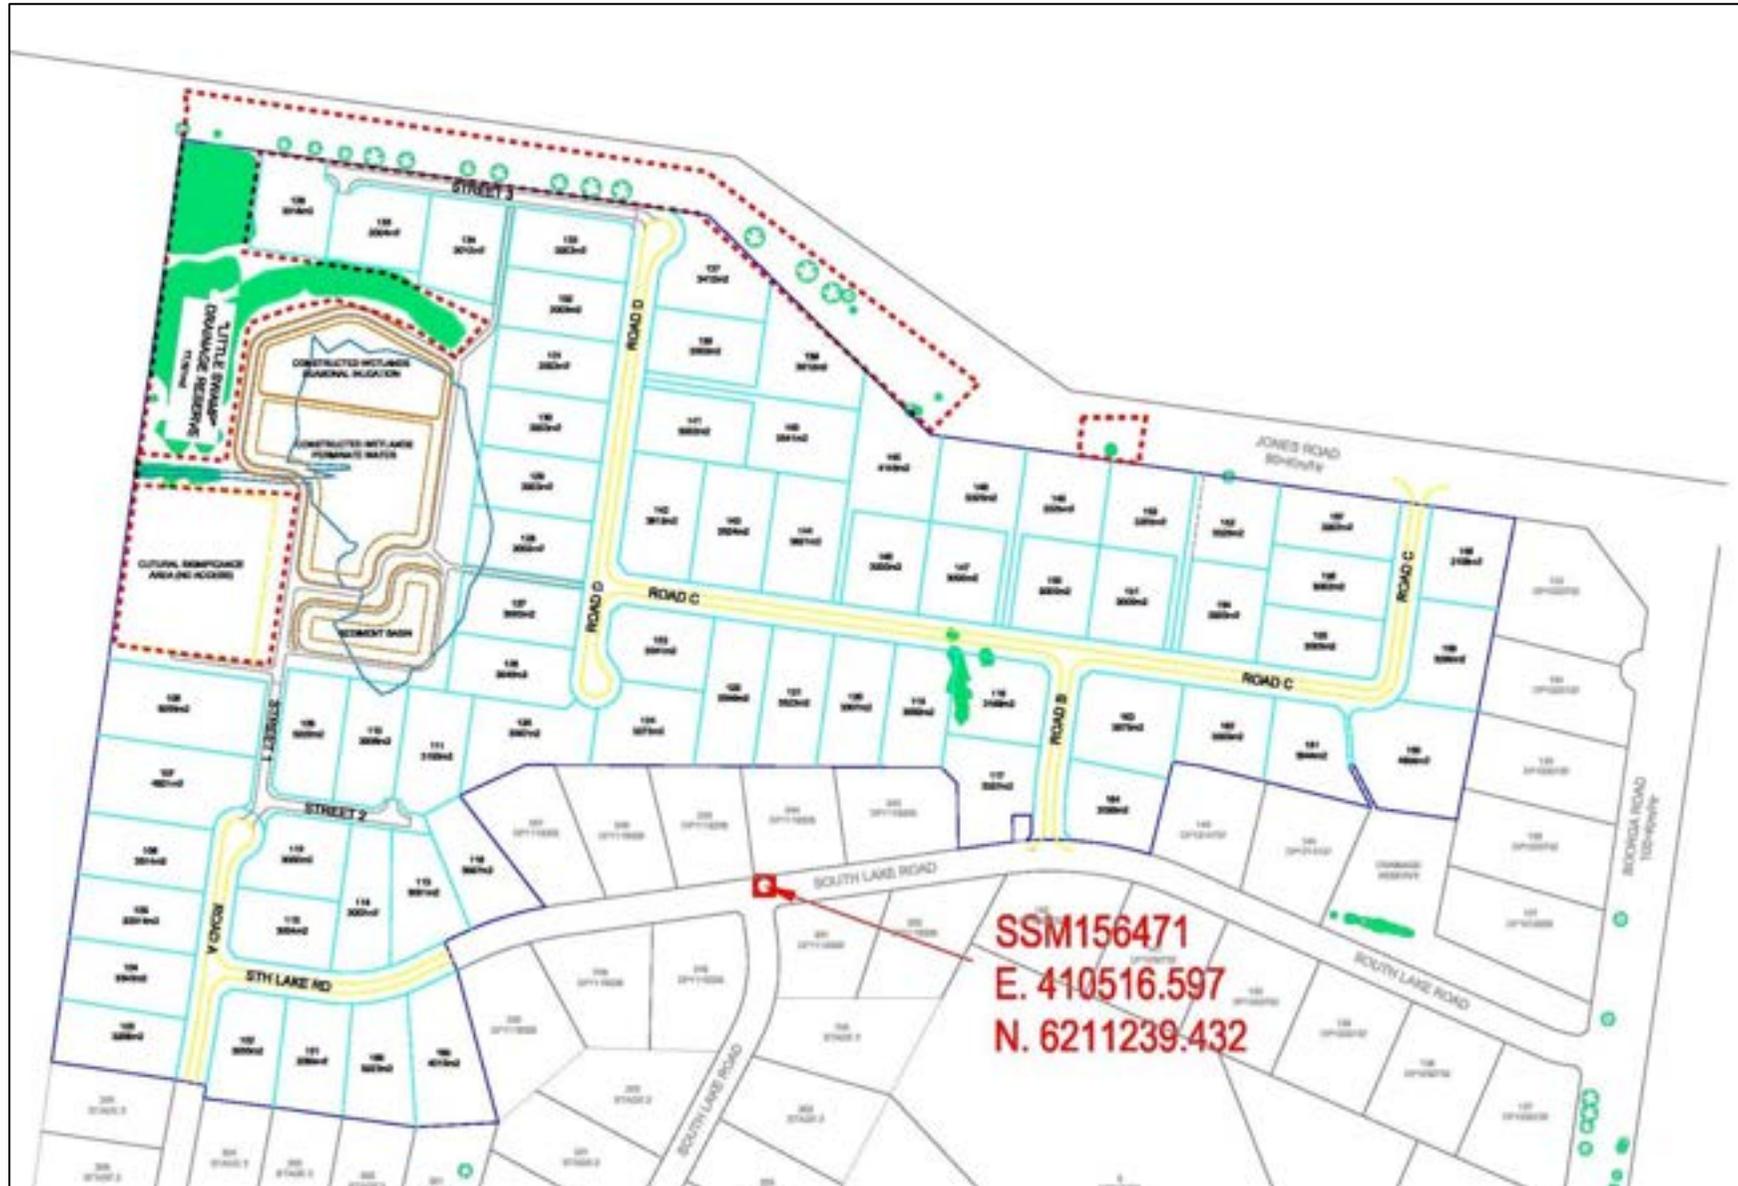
Site Plan showing lots, roads, and exclusion zones (red broken lines).
